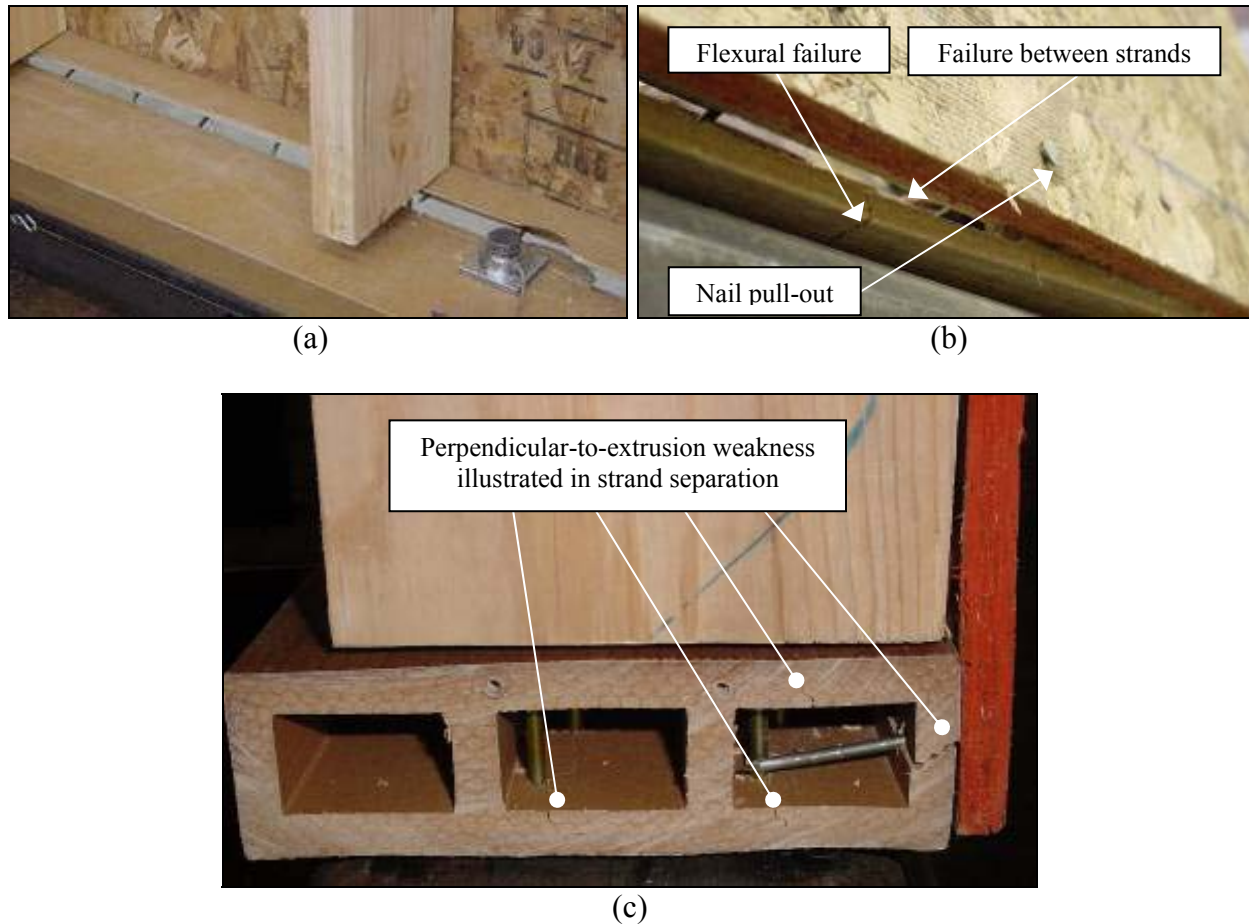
PP5 failures: (a) Side box split down length of sill, (b) Bottom view of split box between outside web and flange and flexural failure, and (c) End view of split showing separation between strands
